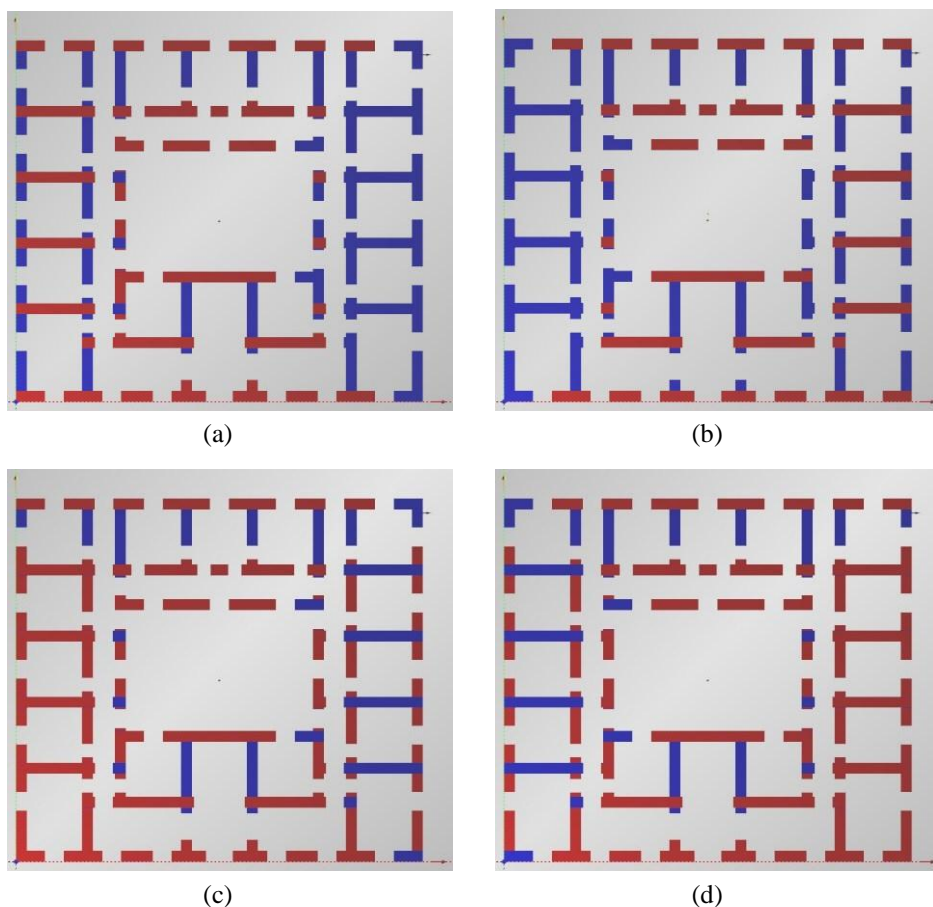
Expected and collapse damage maps related to ground floor plan: (a,c) $\alpha = 30^\circ$;
